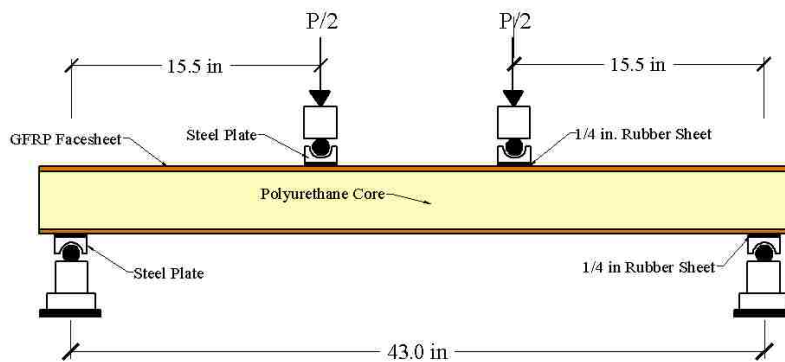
Schematic of four-point bending flexural test setup section (all dimensions in inches, 1 in. = 25.4 mm)
